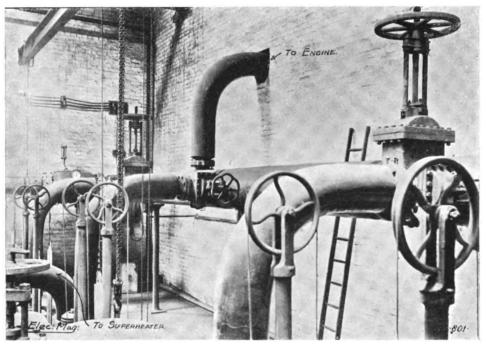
Boiler-House, Arrangement of Steam-Piping.
